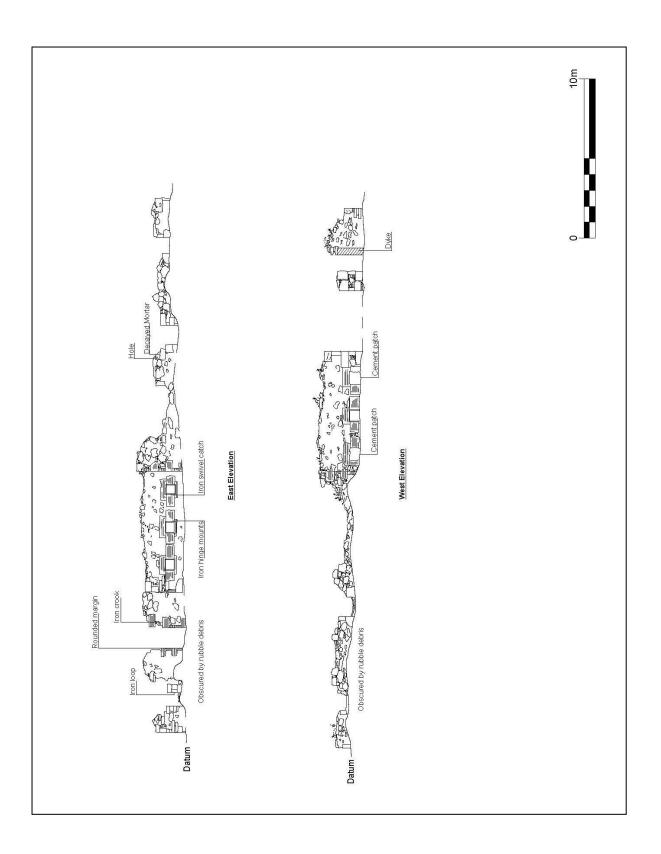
Former Offices and Steadings Elevations (Source: Paul Hogarth)
